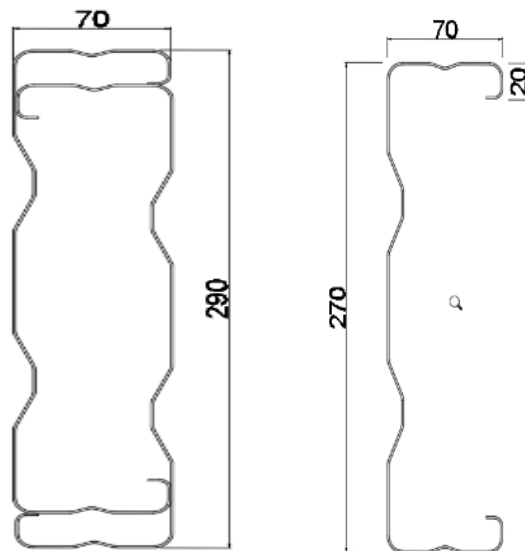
shows geometry and dimensions used for CFS Box truss bridge.
